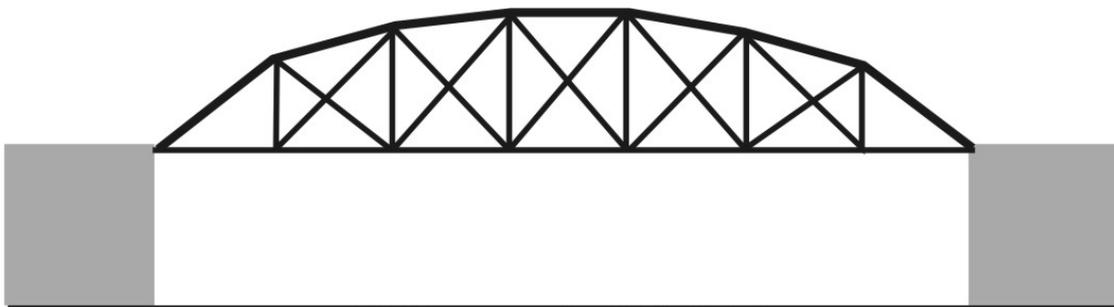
Tivoli Island Bridge (ca.1877), spanning the Rock River Channel from the mainland, Watertown, Jefferson County, Wisconsin. The bridge is an example of the metal bowstring arched truss fabricated by King Iron and Bridge Company of Cleveland, Ohio.
